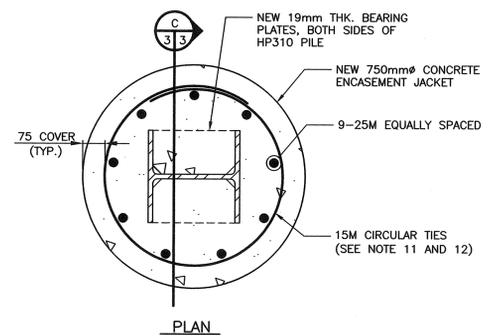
DETAIL - NEW PILE ENCASEMENT (TYP.) 2/33
